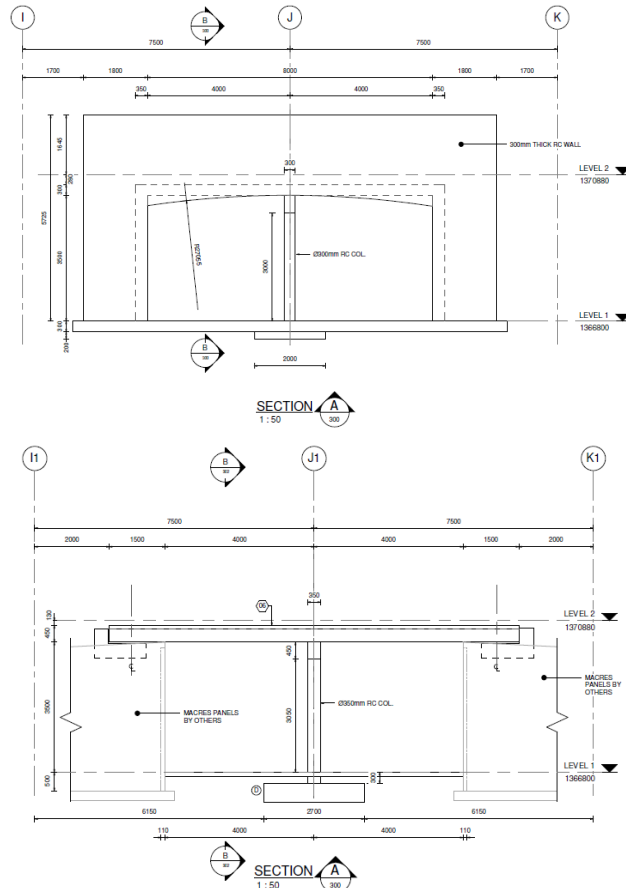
(TOP). First proposal with false bridge abutment – typical section (BOTTOM). True bridge abutment proposal – typical section
